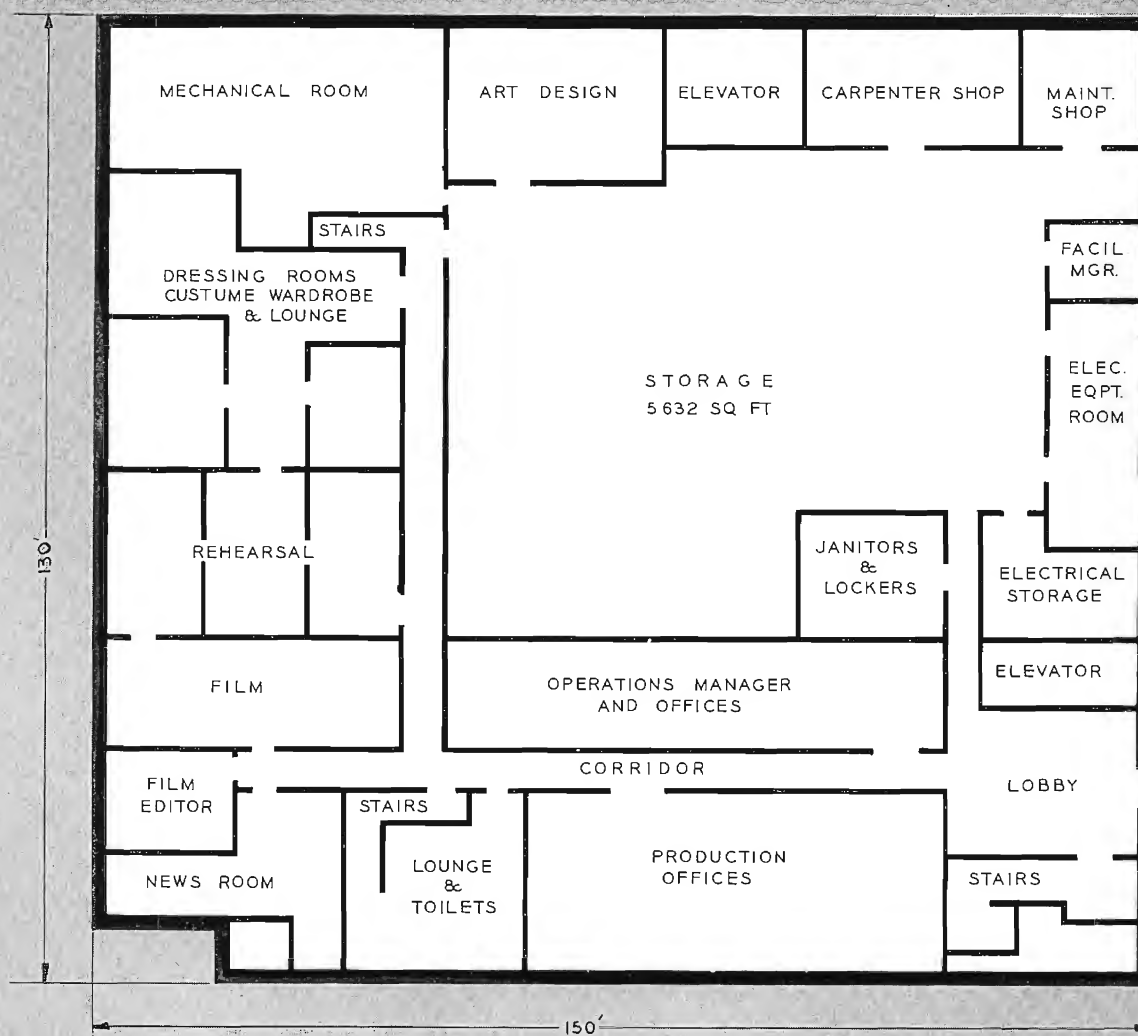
Floor plan of lower level of building shows location of art and film editing facilities.
